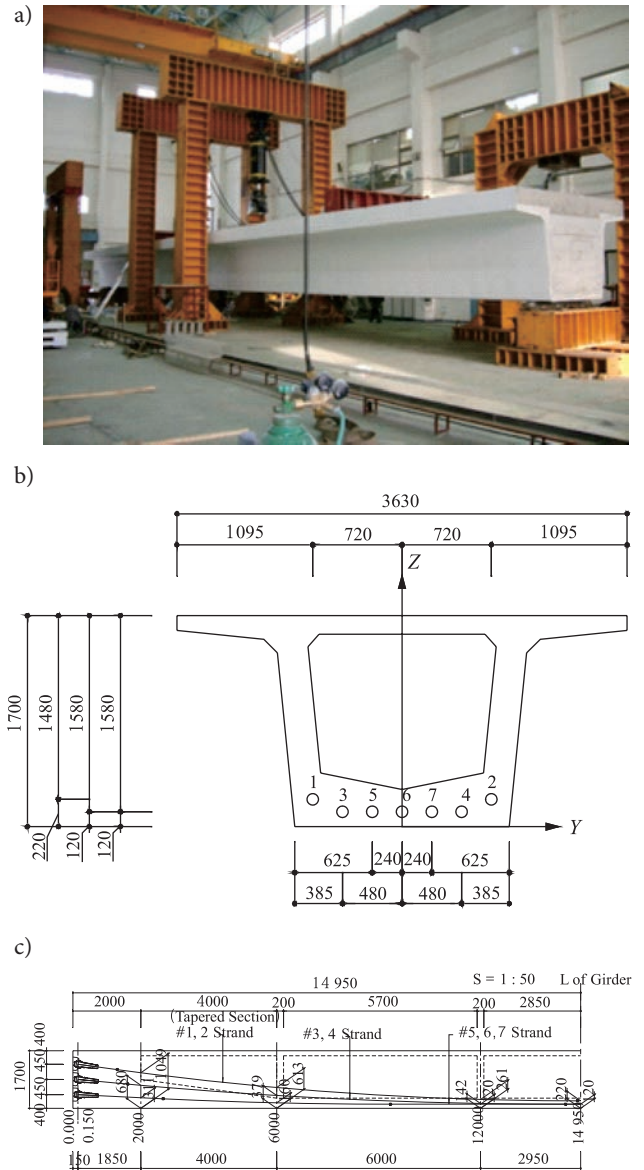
Test specimen: 30 m long, 3.63 m wide and 2.0 m high small post-tensioned concrete box girder, in mm
